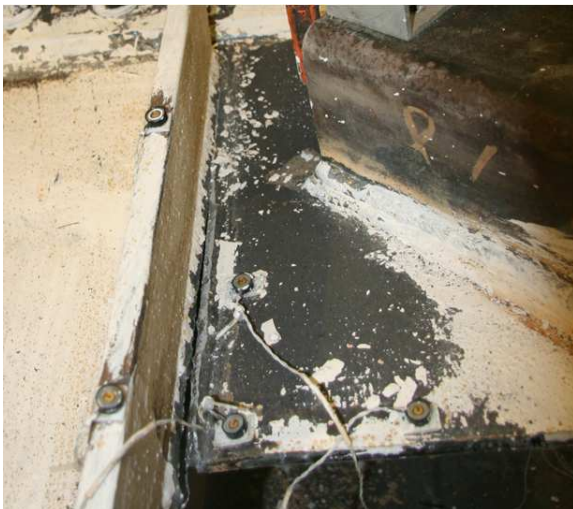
Severe Weld Tearing - W3 NCBF1-R5
